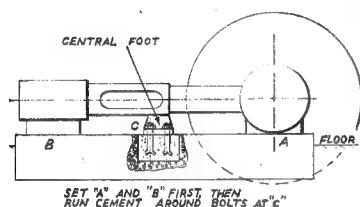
Sketch showing fixing of Tangye type engine on foundation of stone or concrete
